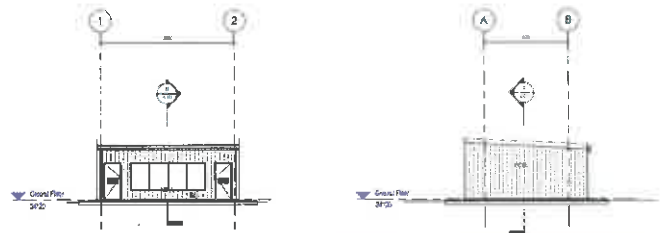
New Mask Testing Facility and Training Shelter South and West Elevations
